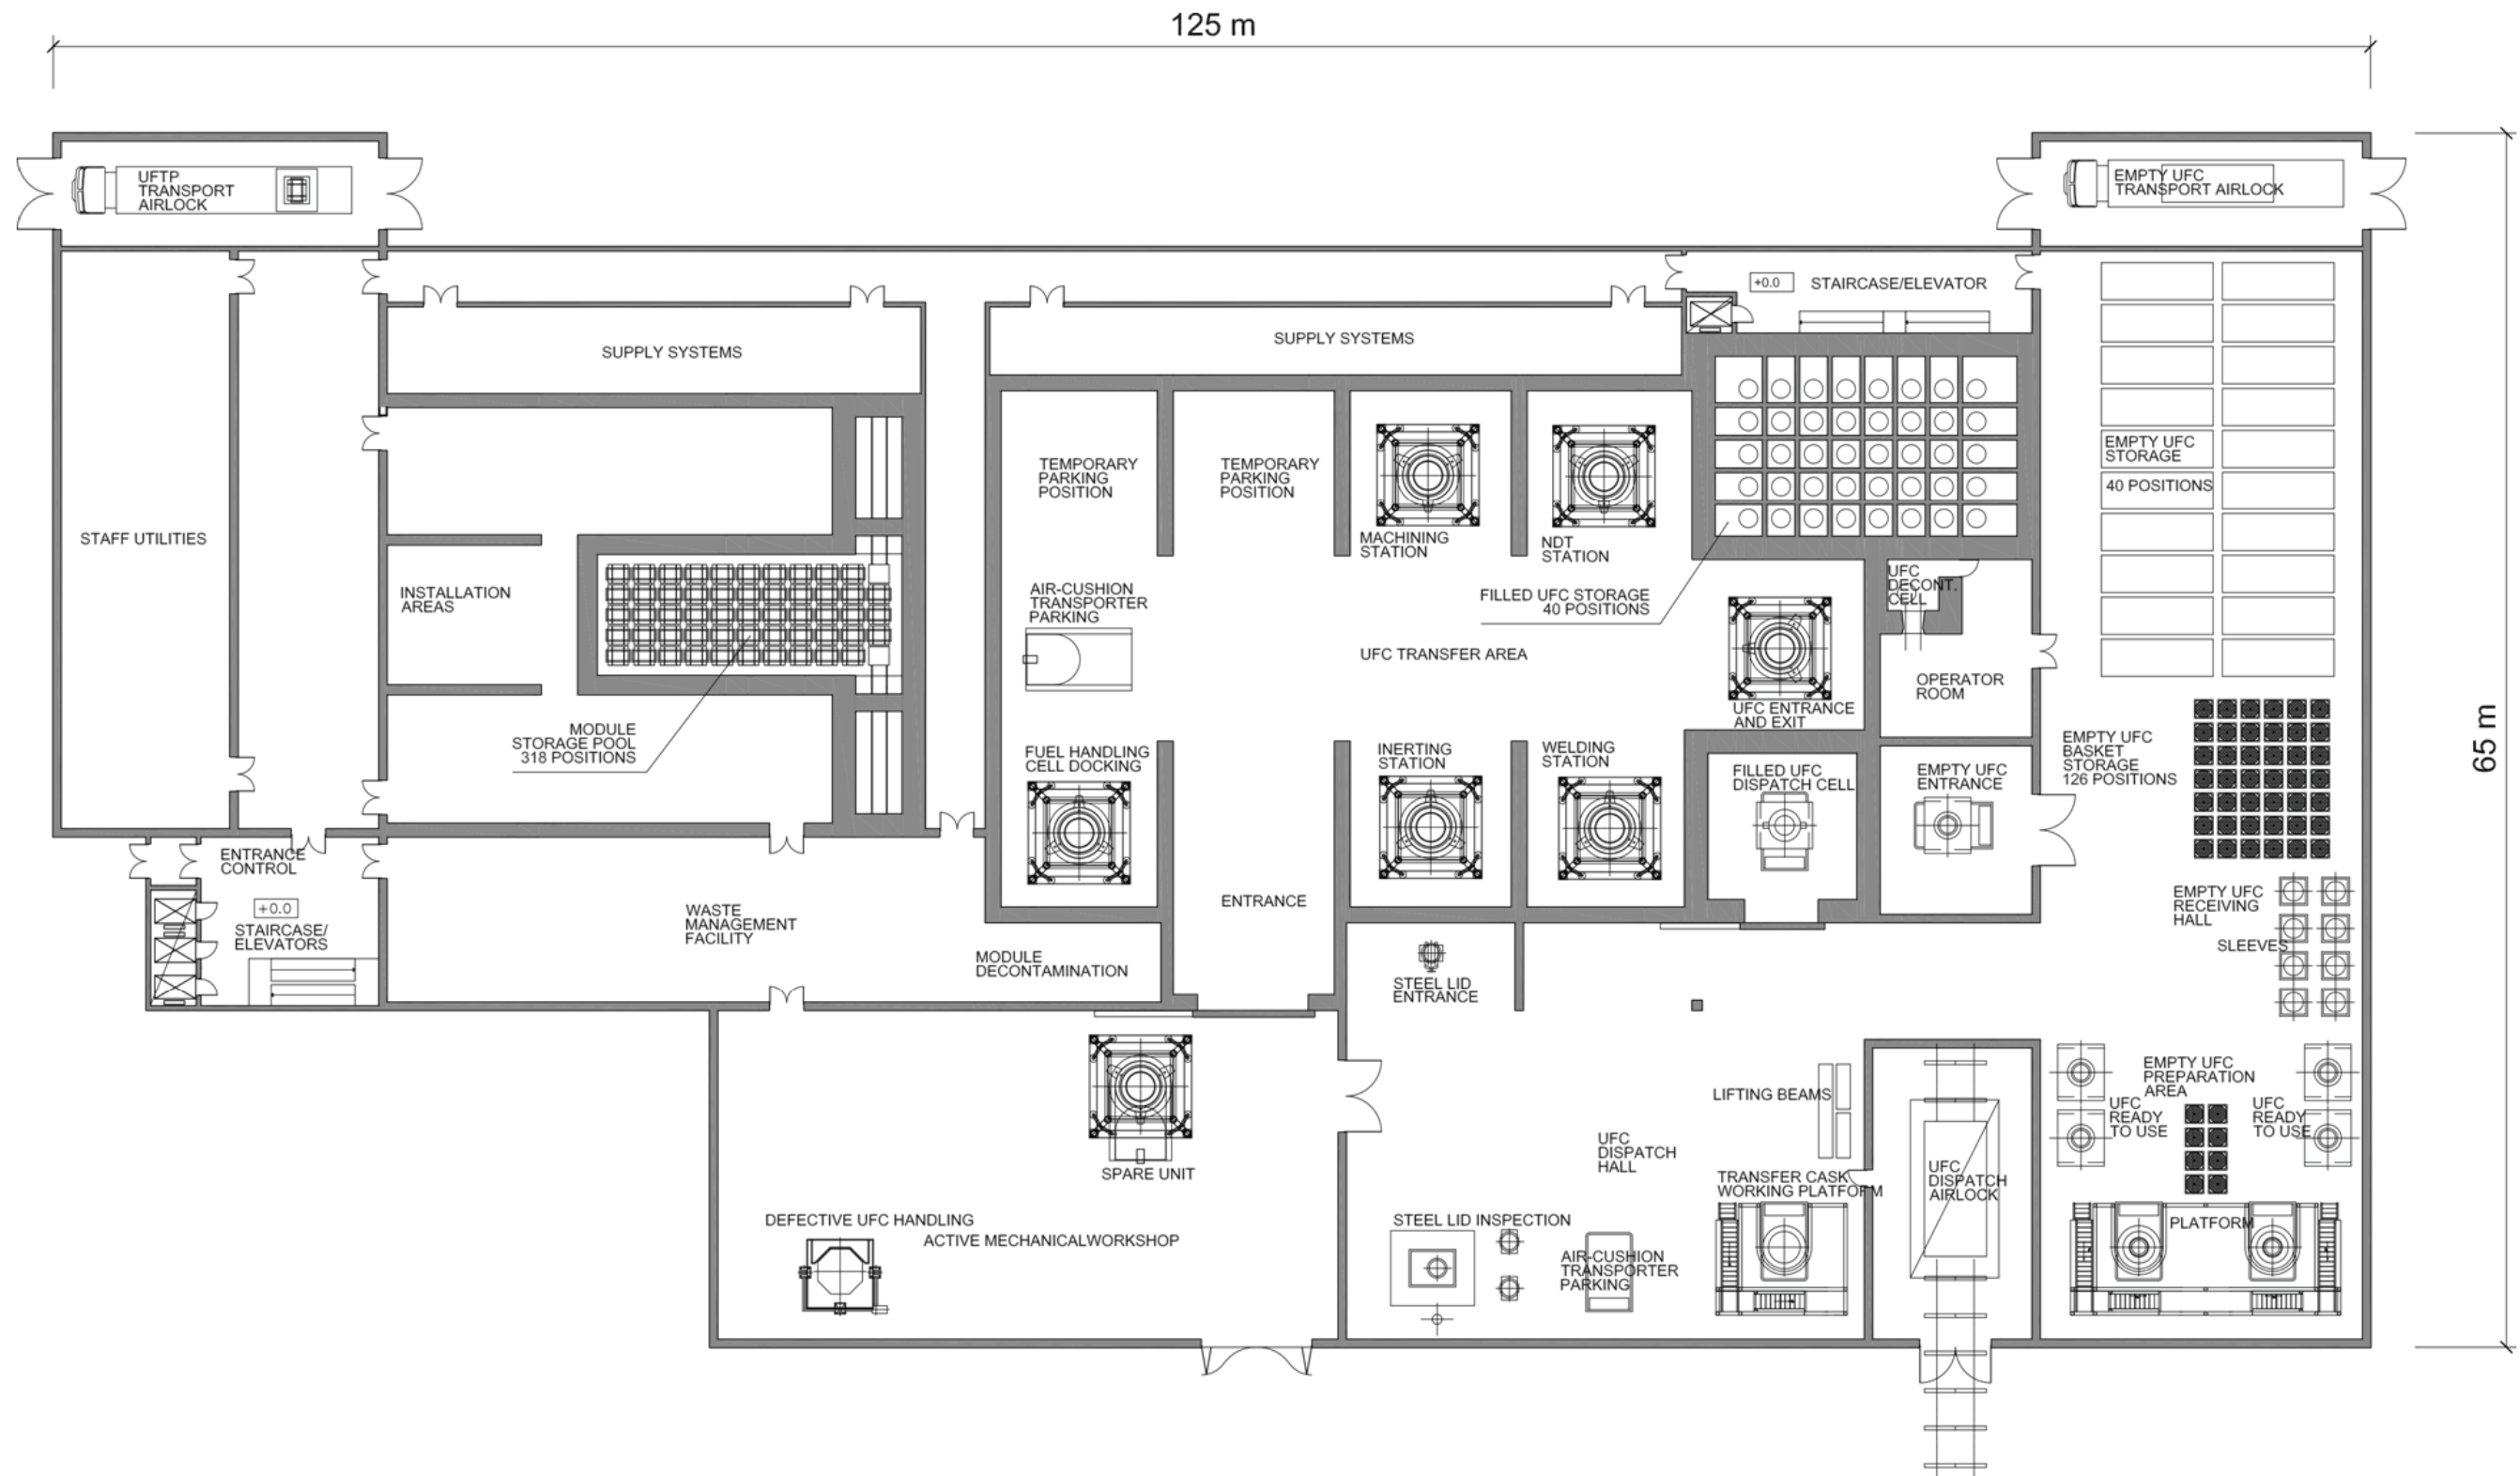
Used Fuel Packaging Plant – Container Transfer Level
